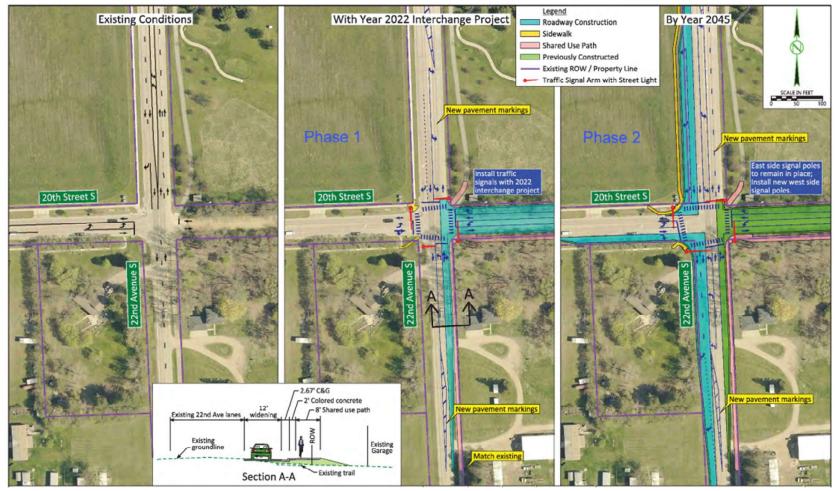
Proposed Improvements Discussed in the 2020 EA to the Intersection of 20th Street South and 22nd Avenue South
